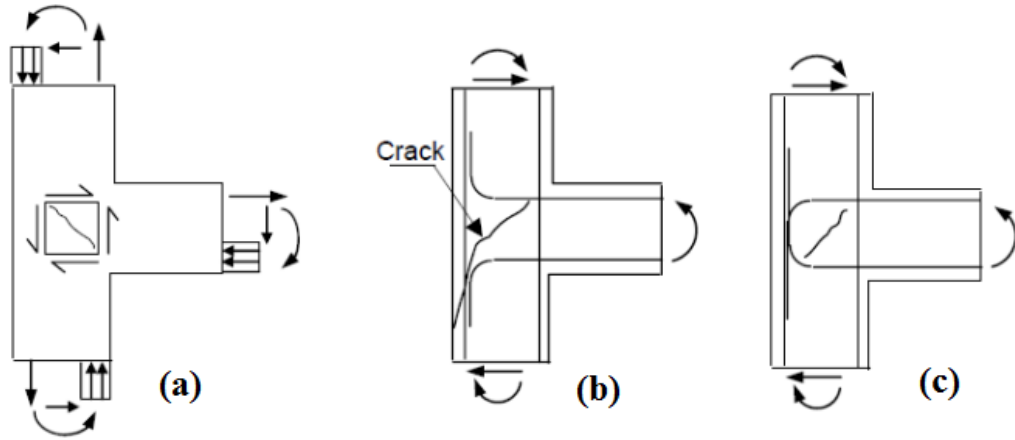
(a) BCJ Forces (b) Bent-up longitudinal rebar (c) Bent-in Longitudinal rebar
